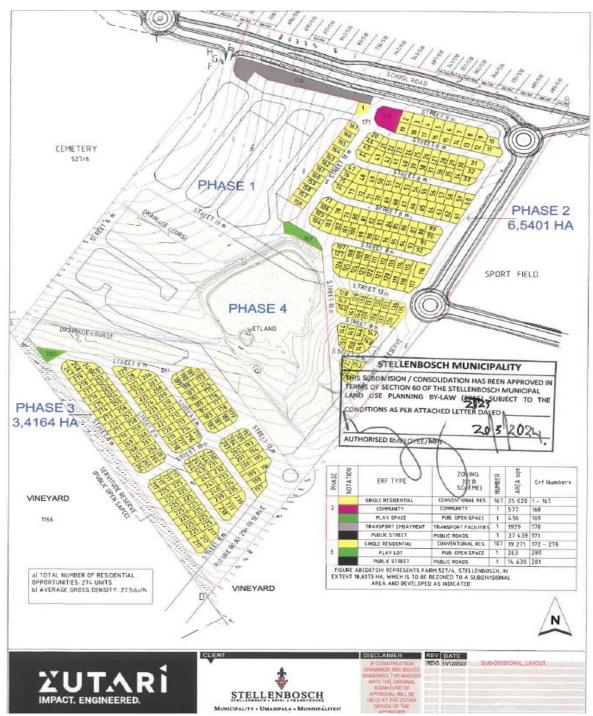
Approved Site Layout Plan for Phases 2 & 3, Jamestown, Stellenbosch
